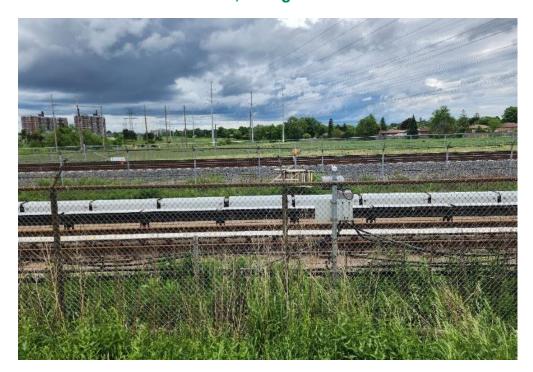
Sloped area south of Lawrence East Station, facing northwest.
